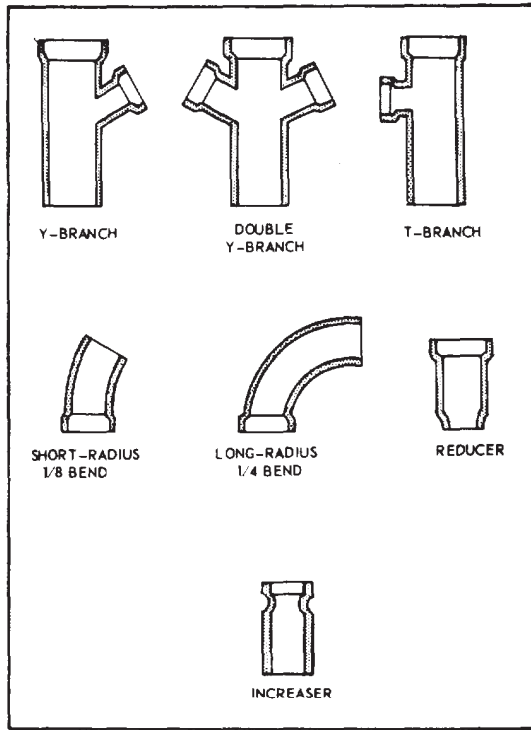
Cross section of vitrified clay or concrete pipe fittings.
